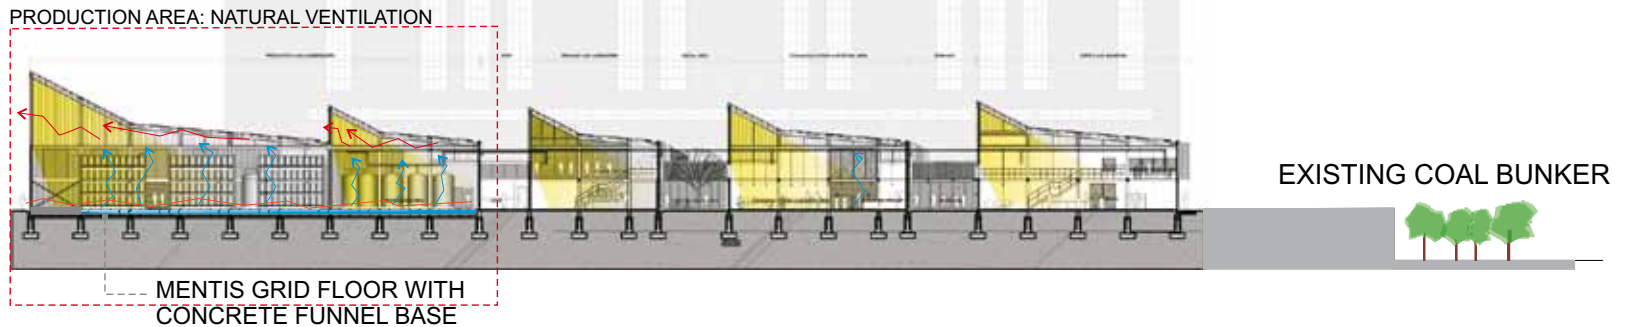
The floor of the production area is a raised steel mentis grid floor with a concrete funnel base which would allow for any spillage to be saved. The strategy is aimed at using use rainwater to run down the funnel base to move and 'wash' the oil (washing the oil is a process where the impurities of the discarded cooking oil react with the water). The constant water movement will cool the air from the lower level vents, that will be used to naturally ventilate the production area: Author 2010.
